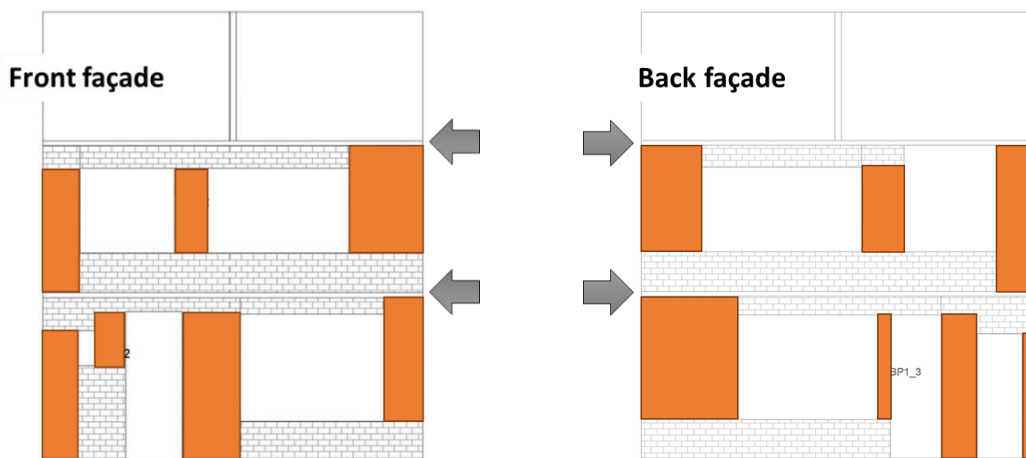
Piers defined on the front and back façades of Building D house for negative loading.
